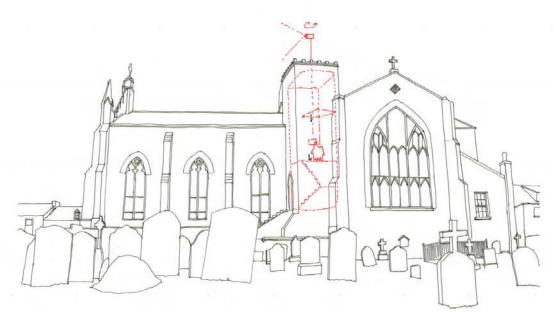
Sketch proposal for access to tower interior & camera obscura at Desmond's Tower.
